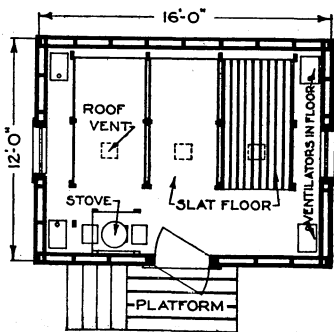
Floor plan of a sweet-potato storage house, size 12 by 16 feet, having a capacity of 400 to 500 bushels in crates or 450 to 500 bushels in bulk
